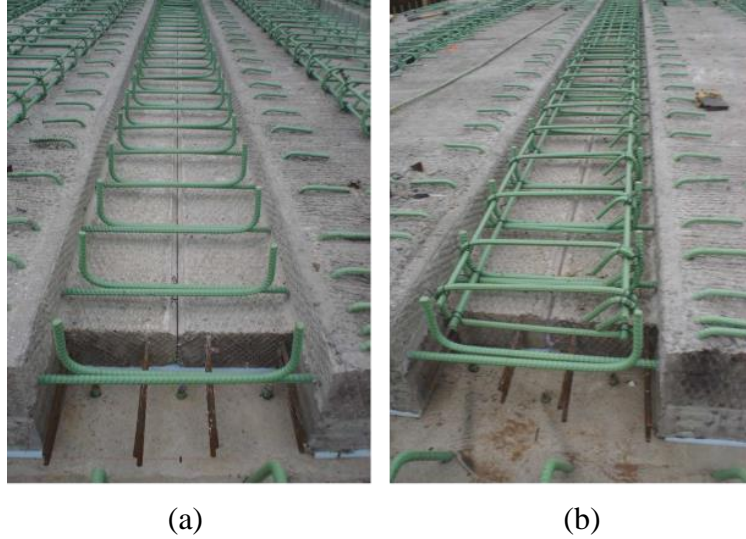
New type of developed joints [47]: (a) joint between PCSS panels (90-degree hooks) and (b) drop-in reinforced cage
